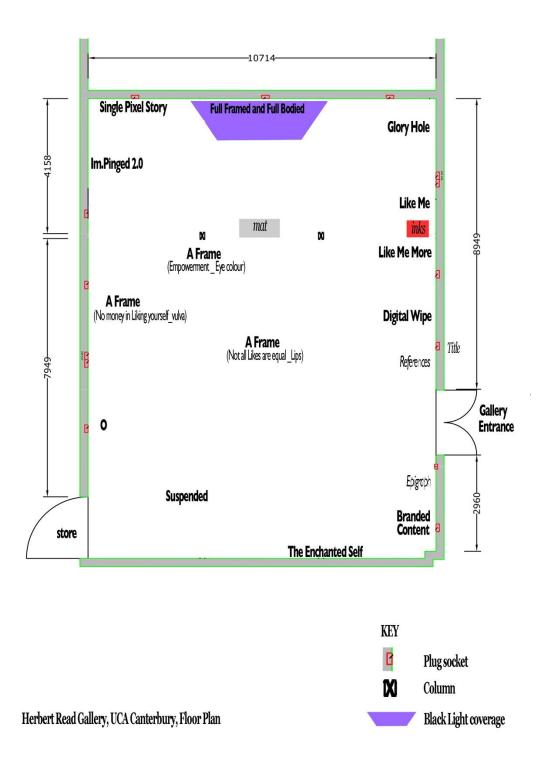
Exhibition installation plan for CON\$ENT, Herbert Read Gallery, UCA Canterbury, Floor Plan ©UCA
